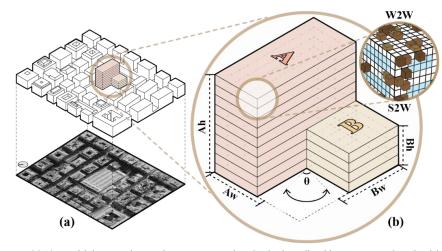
(a) Proposed building site in Genoa, Italy and (b) The building form and relevant design parameters
